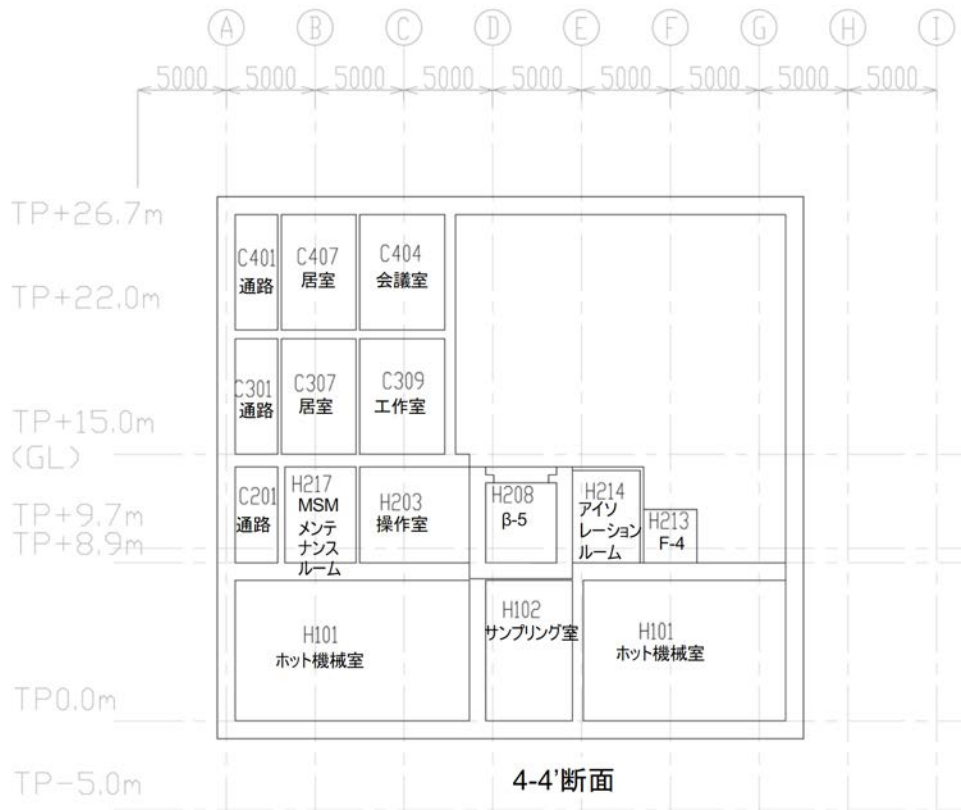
Elevation view of PIE facility (4-4').
